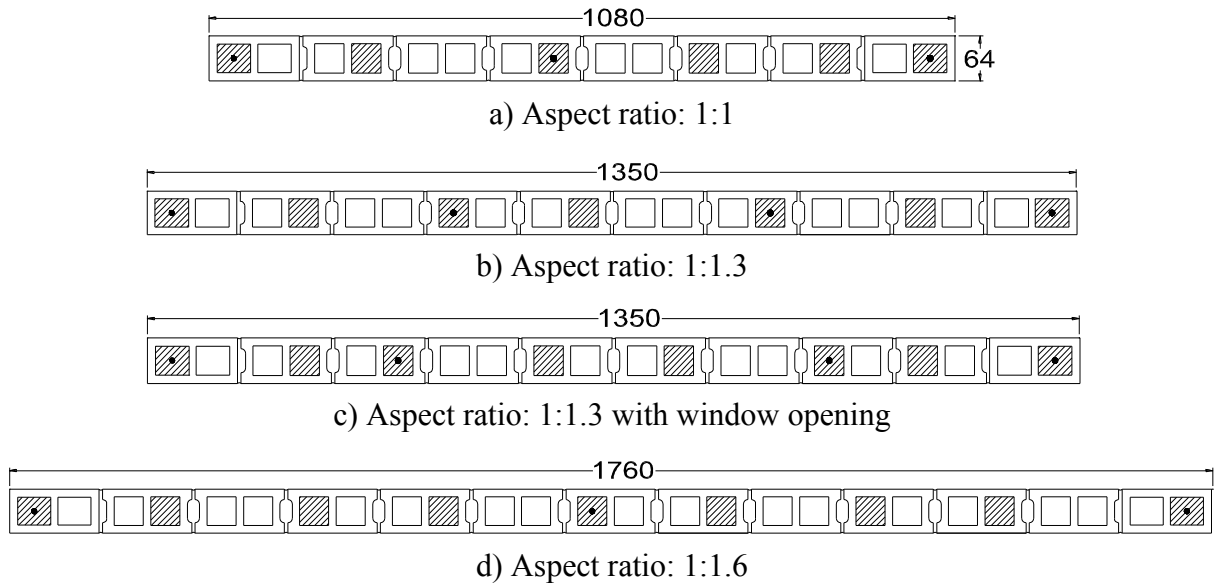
Grouting and reinforcement patterns of the partially grouted walls
